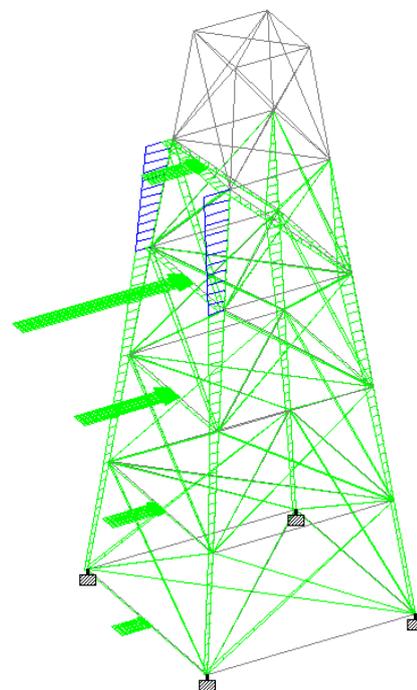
Application of wave & current load on Jacket structure and conductors pipes
